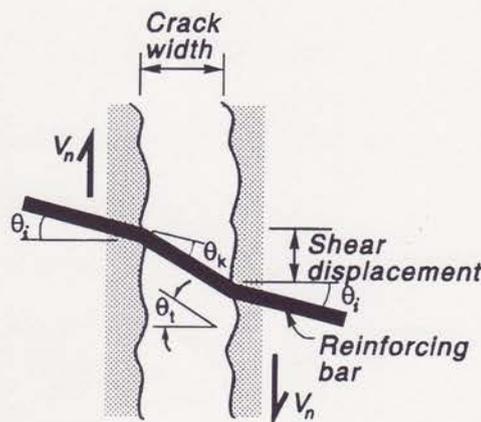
Shear Transferred by Kinking of Reinforcement Across a Wide Crack
